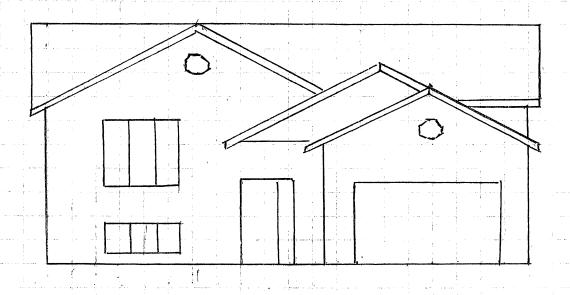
Elevation Plan File No.: A-01-20, Donald Henderson, Part Lot 6, Block 57 & Part of Martha Street, Plan 279, Town of Ingersoll
